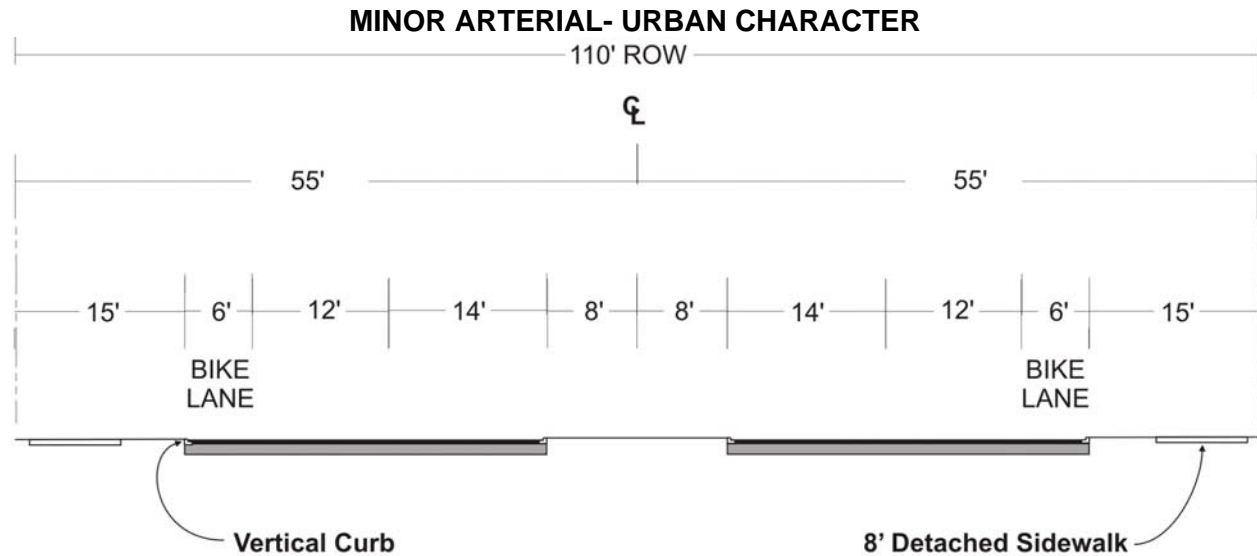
ROADWAY CROSS SECTIONS (Continued)
